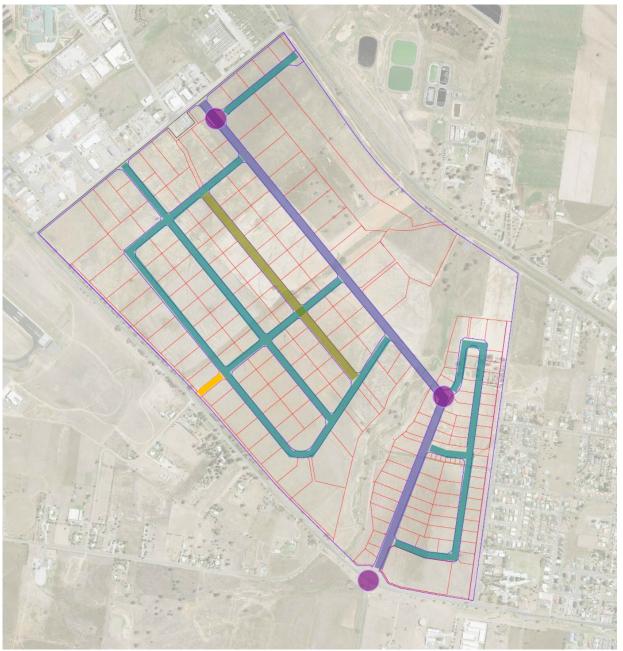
Overview of road layouts and features - standard road (blue), Bandaar Drive and Dhulii Drive (purple), Burrugaabu Avenue (green), roundabouts (purple dots), potential future Oxley Highway access (gold)
